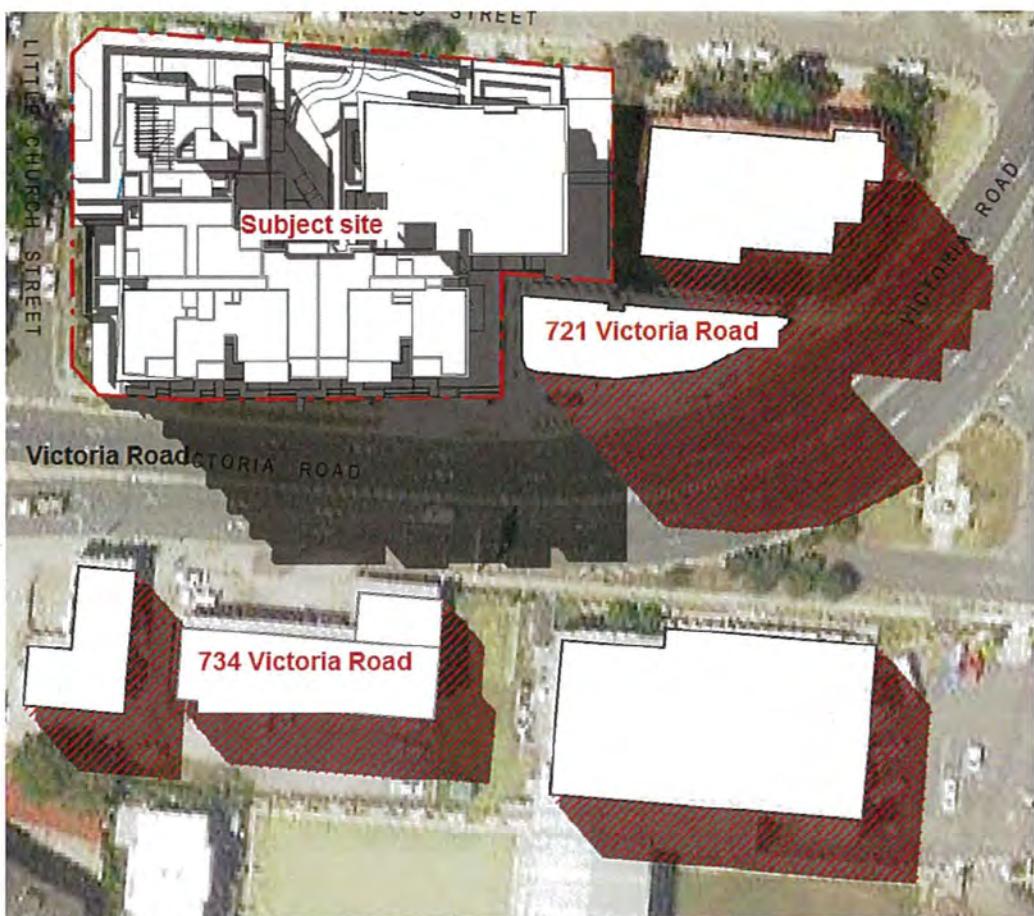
Overshadowing at 12 noon– some overshadowing to the north west corner of 721 Victoria Road.
